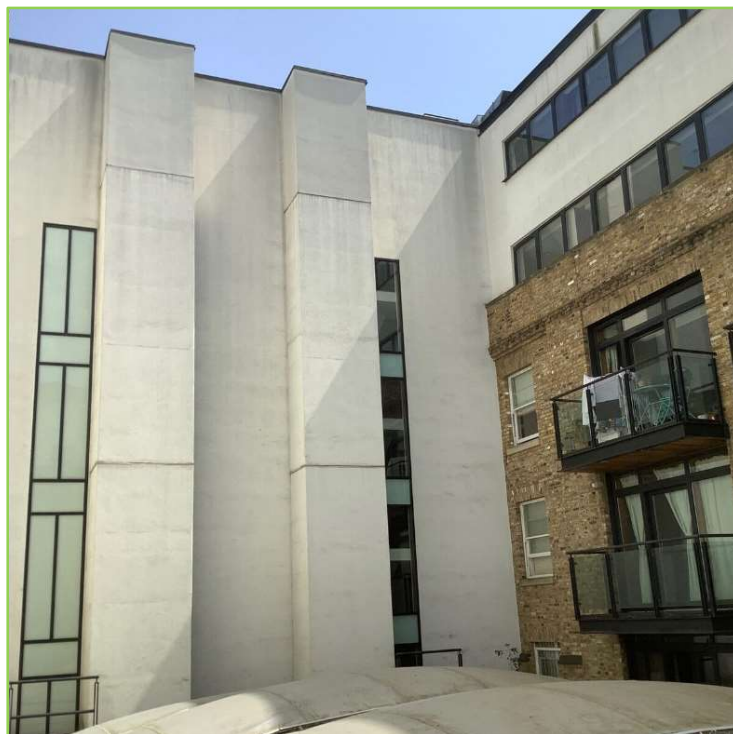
Courtyard North-west facing elevation showing masonry and render system.
